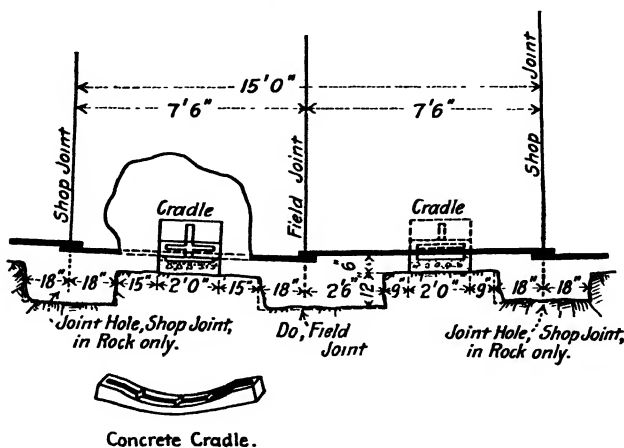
Keyed cradle and excavation for field joint in rock.
